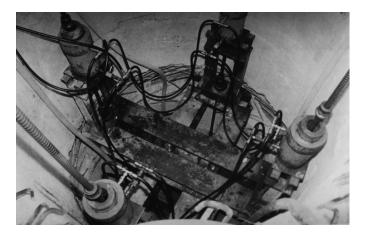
Jacks and Hydraulic Connections inside Working Rooms
